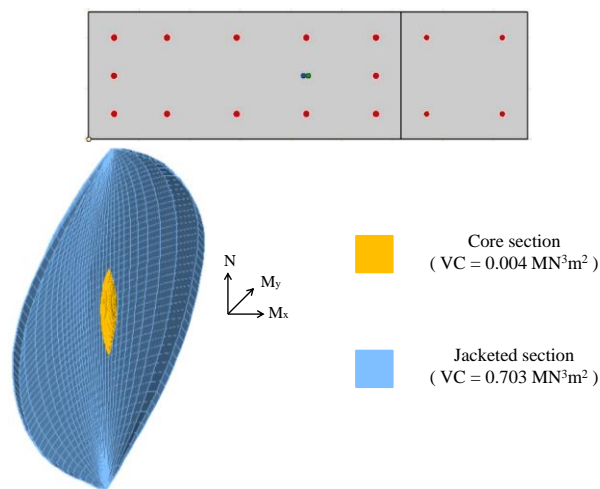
Left: Jacketed section, Right: 3d failure curves (column S0C3) - Case 2
